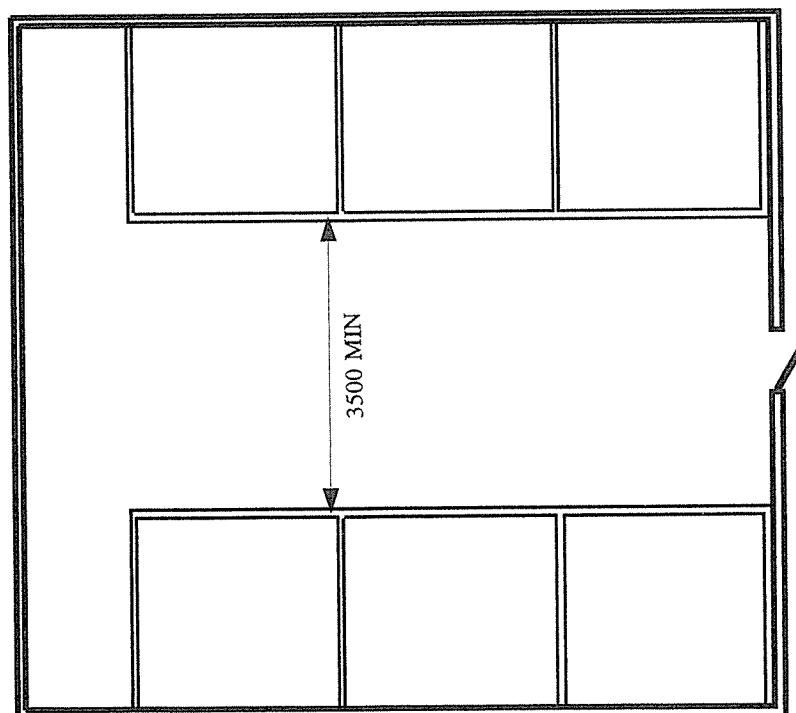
Typical Otis Well and Machine Room Plan, Multiple Shafts Opposite
